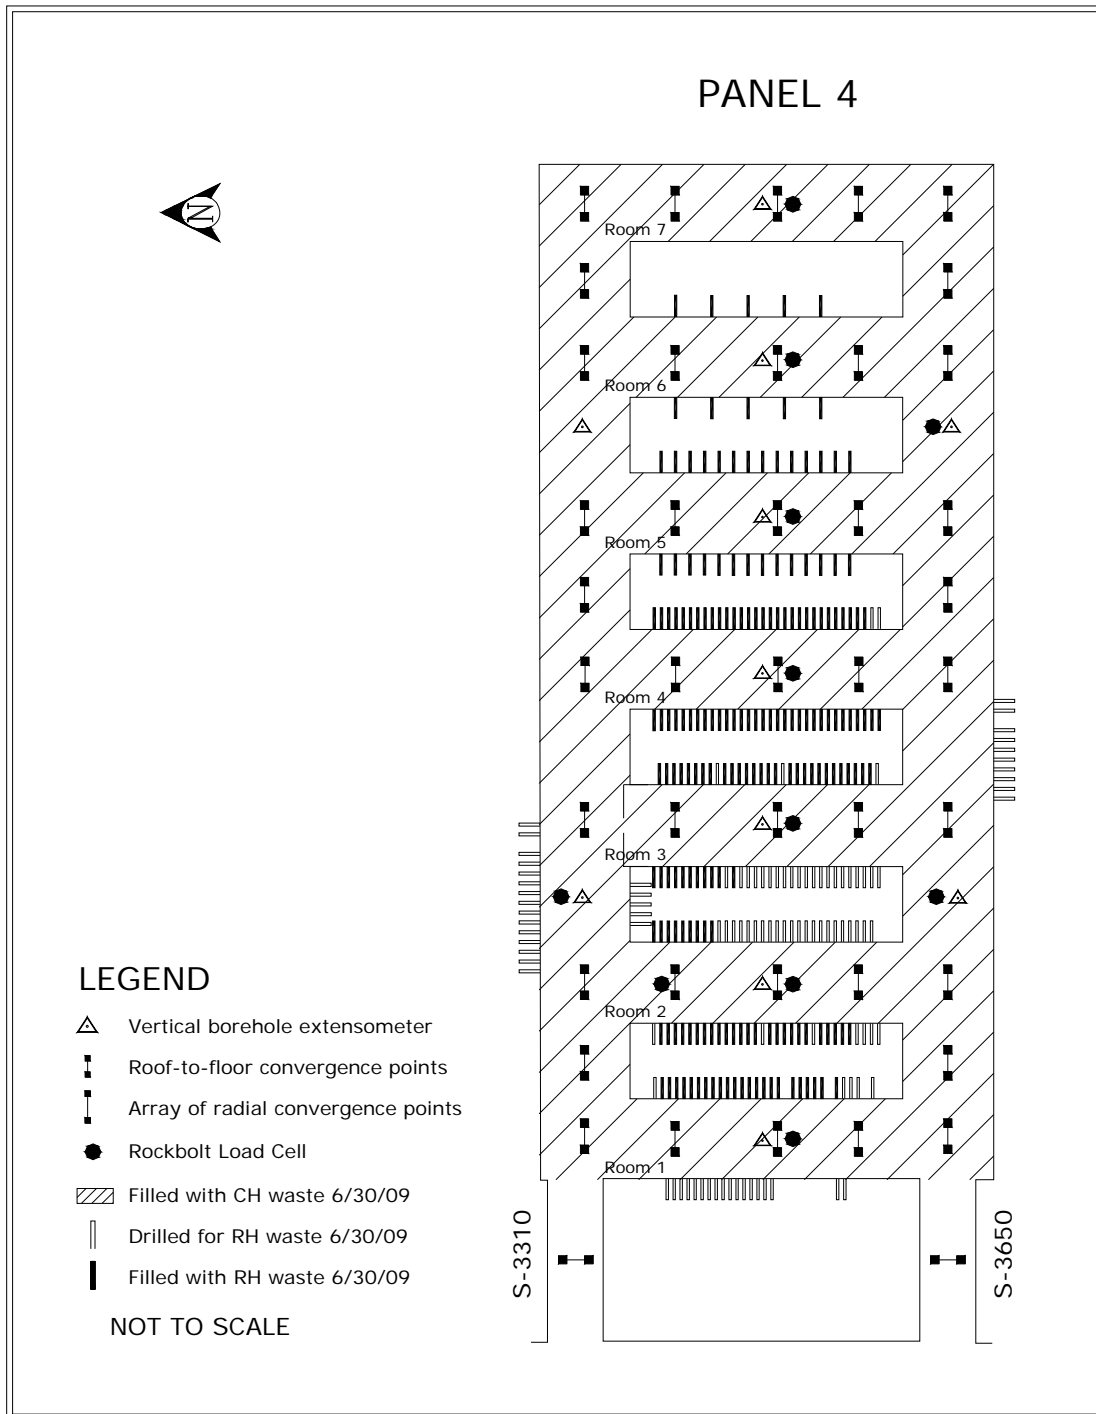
Location of Panel 4 Geotechnical Instruments
